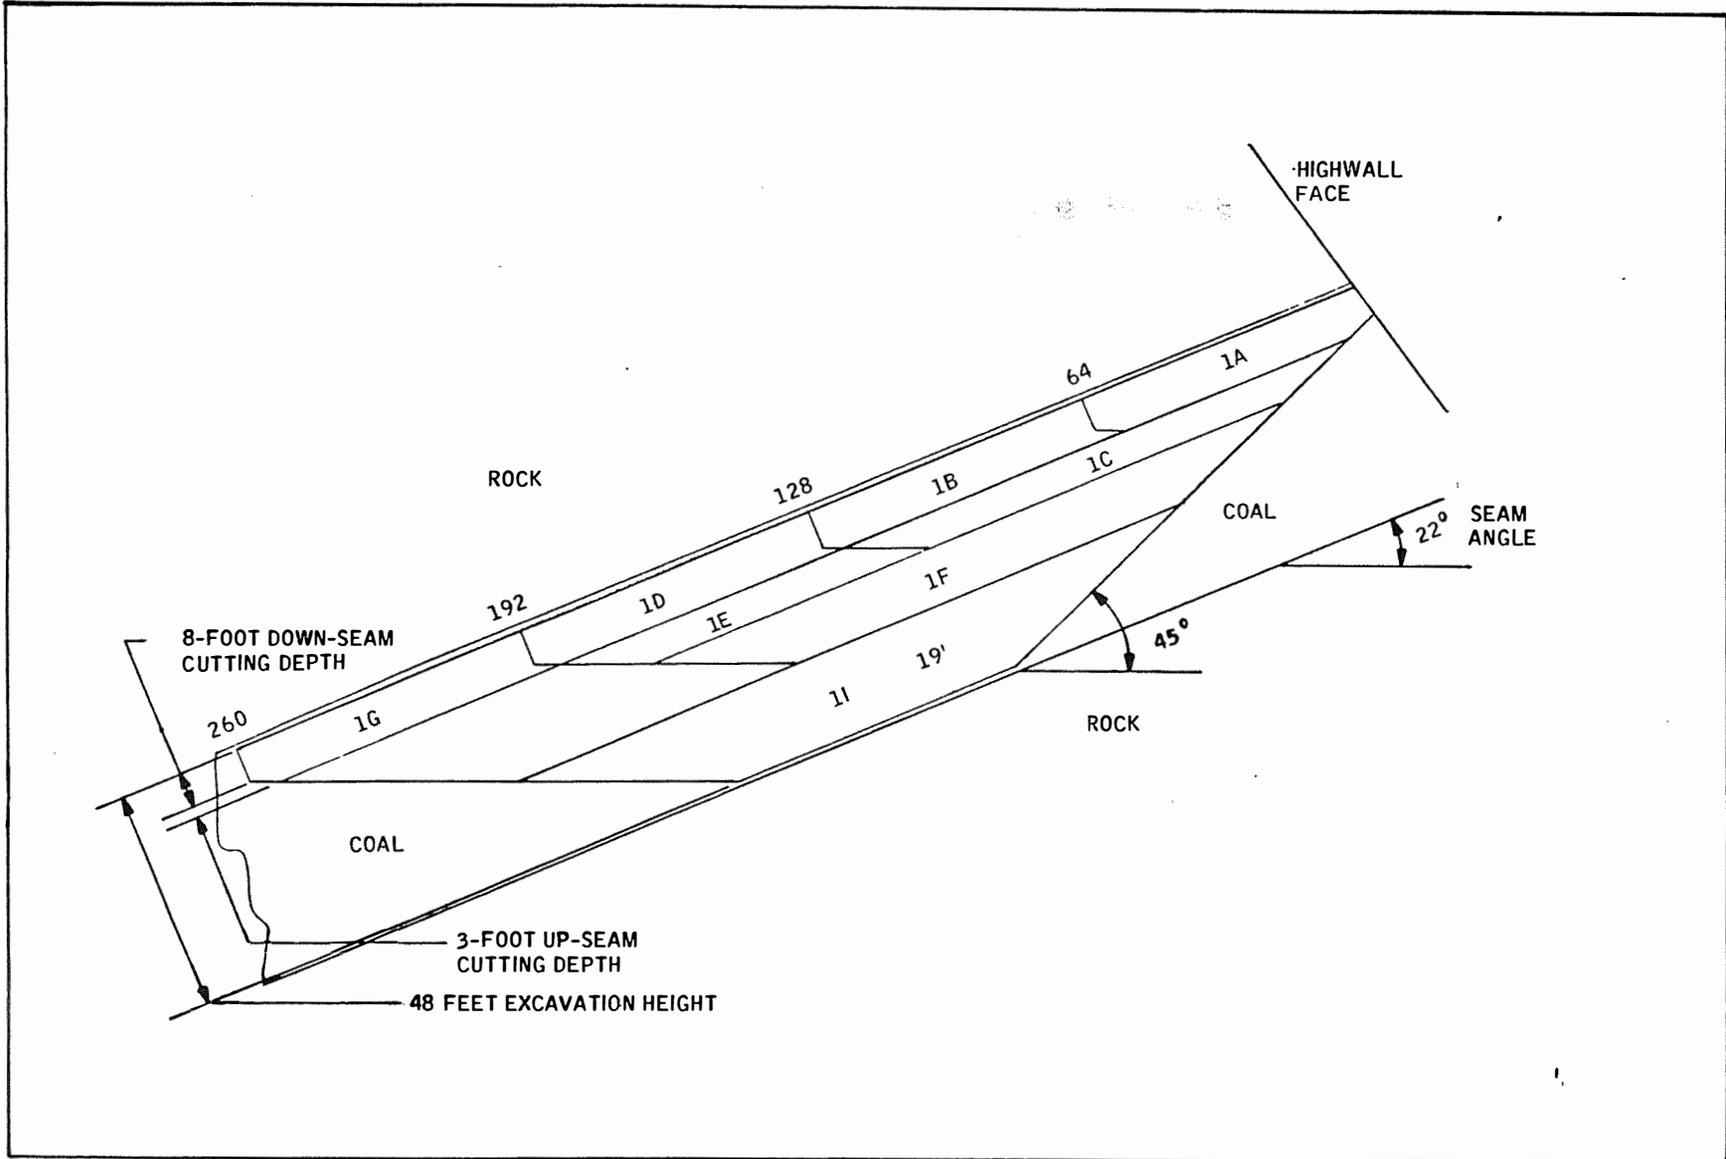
MOTORIZED SLACKLINE EXCAVATOR, SHIFT 1 MINING PLAN
